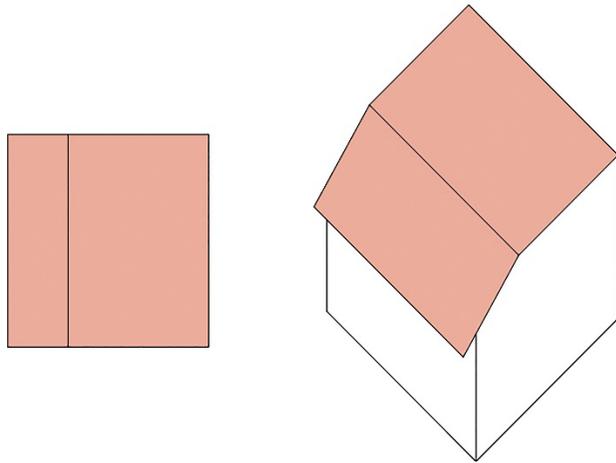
Flat roof in combination with a sloping roof on one side
